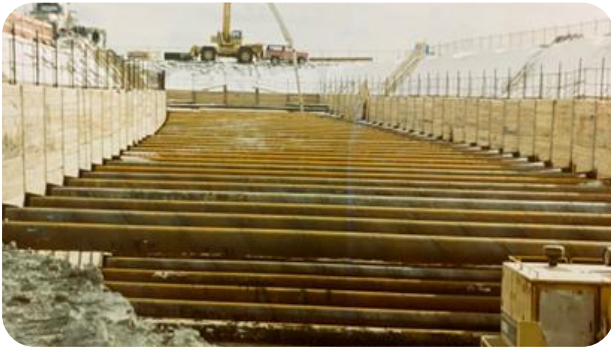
Strutted excavation for Spadina subway extension, Toronto.
